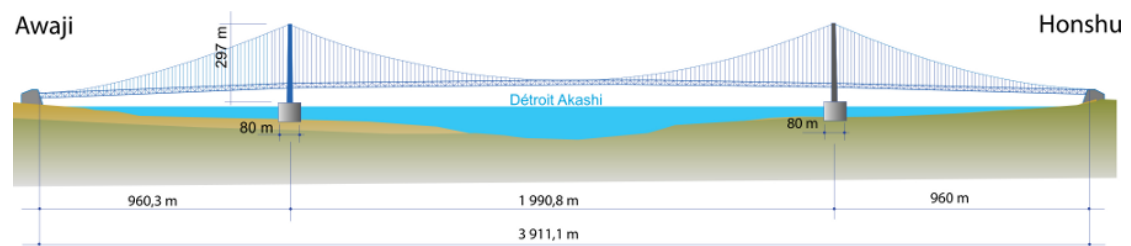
Akashi Kaikyo bridge in Japan, the longest suspension bridge in the world. The foundation consists of major caissons.
